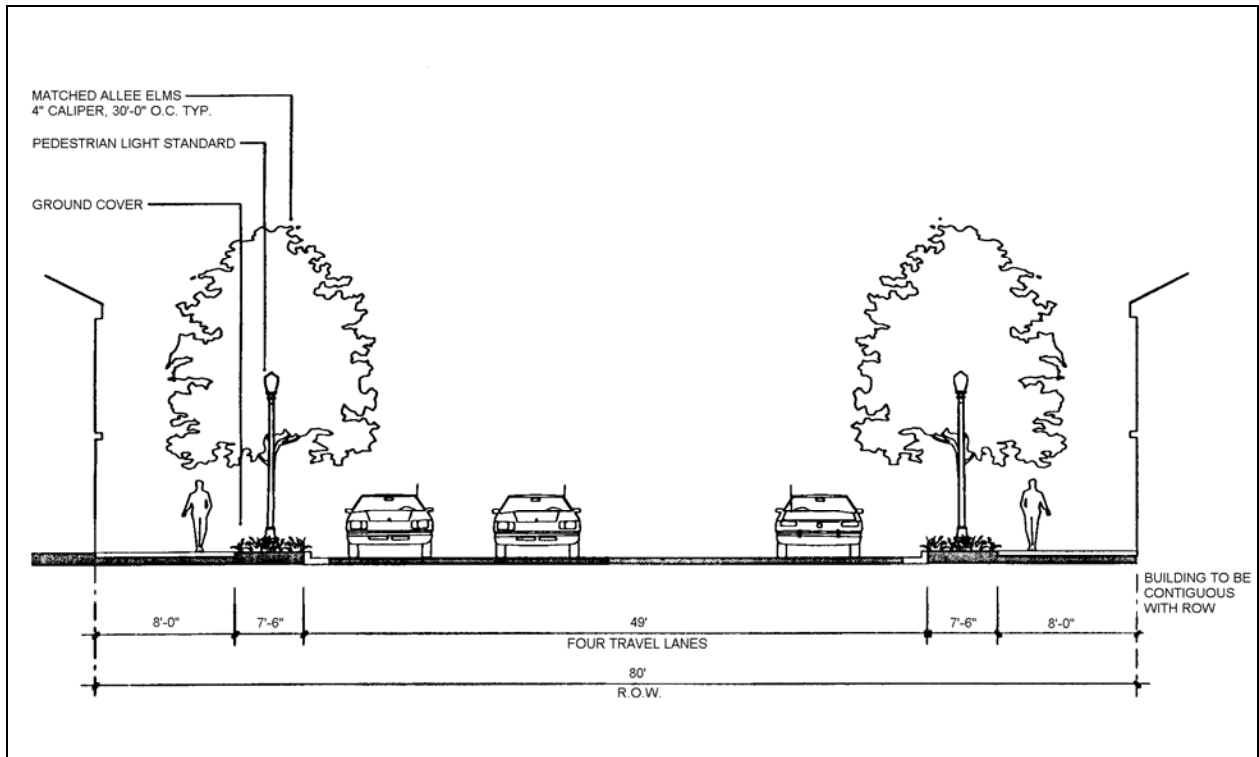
Bear Creek Parkway at Town Center (Undivided Cross Section)
